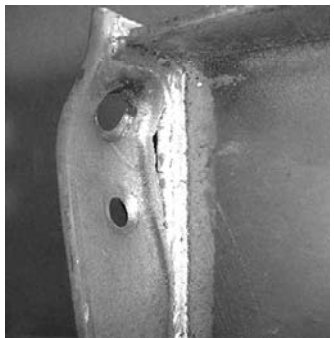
Fracture of endplate in test specimen after test at 20°C
